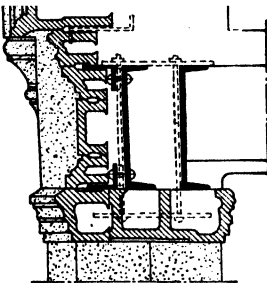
Spandrel section showing method of supporting terra cotta.
